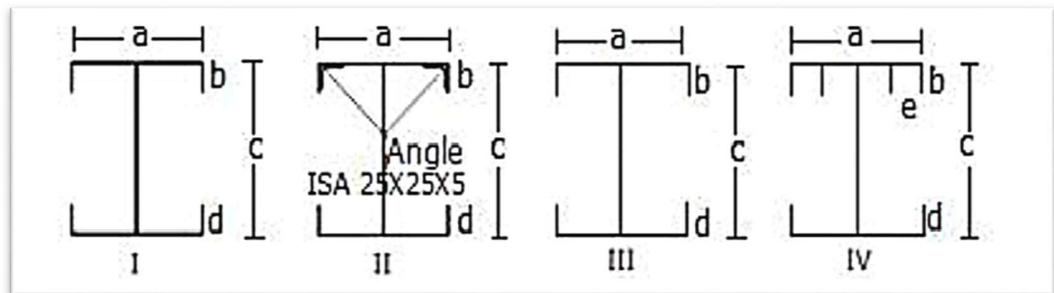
Cross-sections of the tested beams by Dar et al (2018). ^[14]
